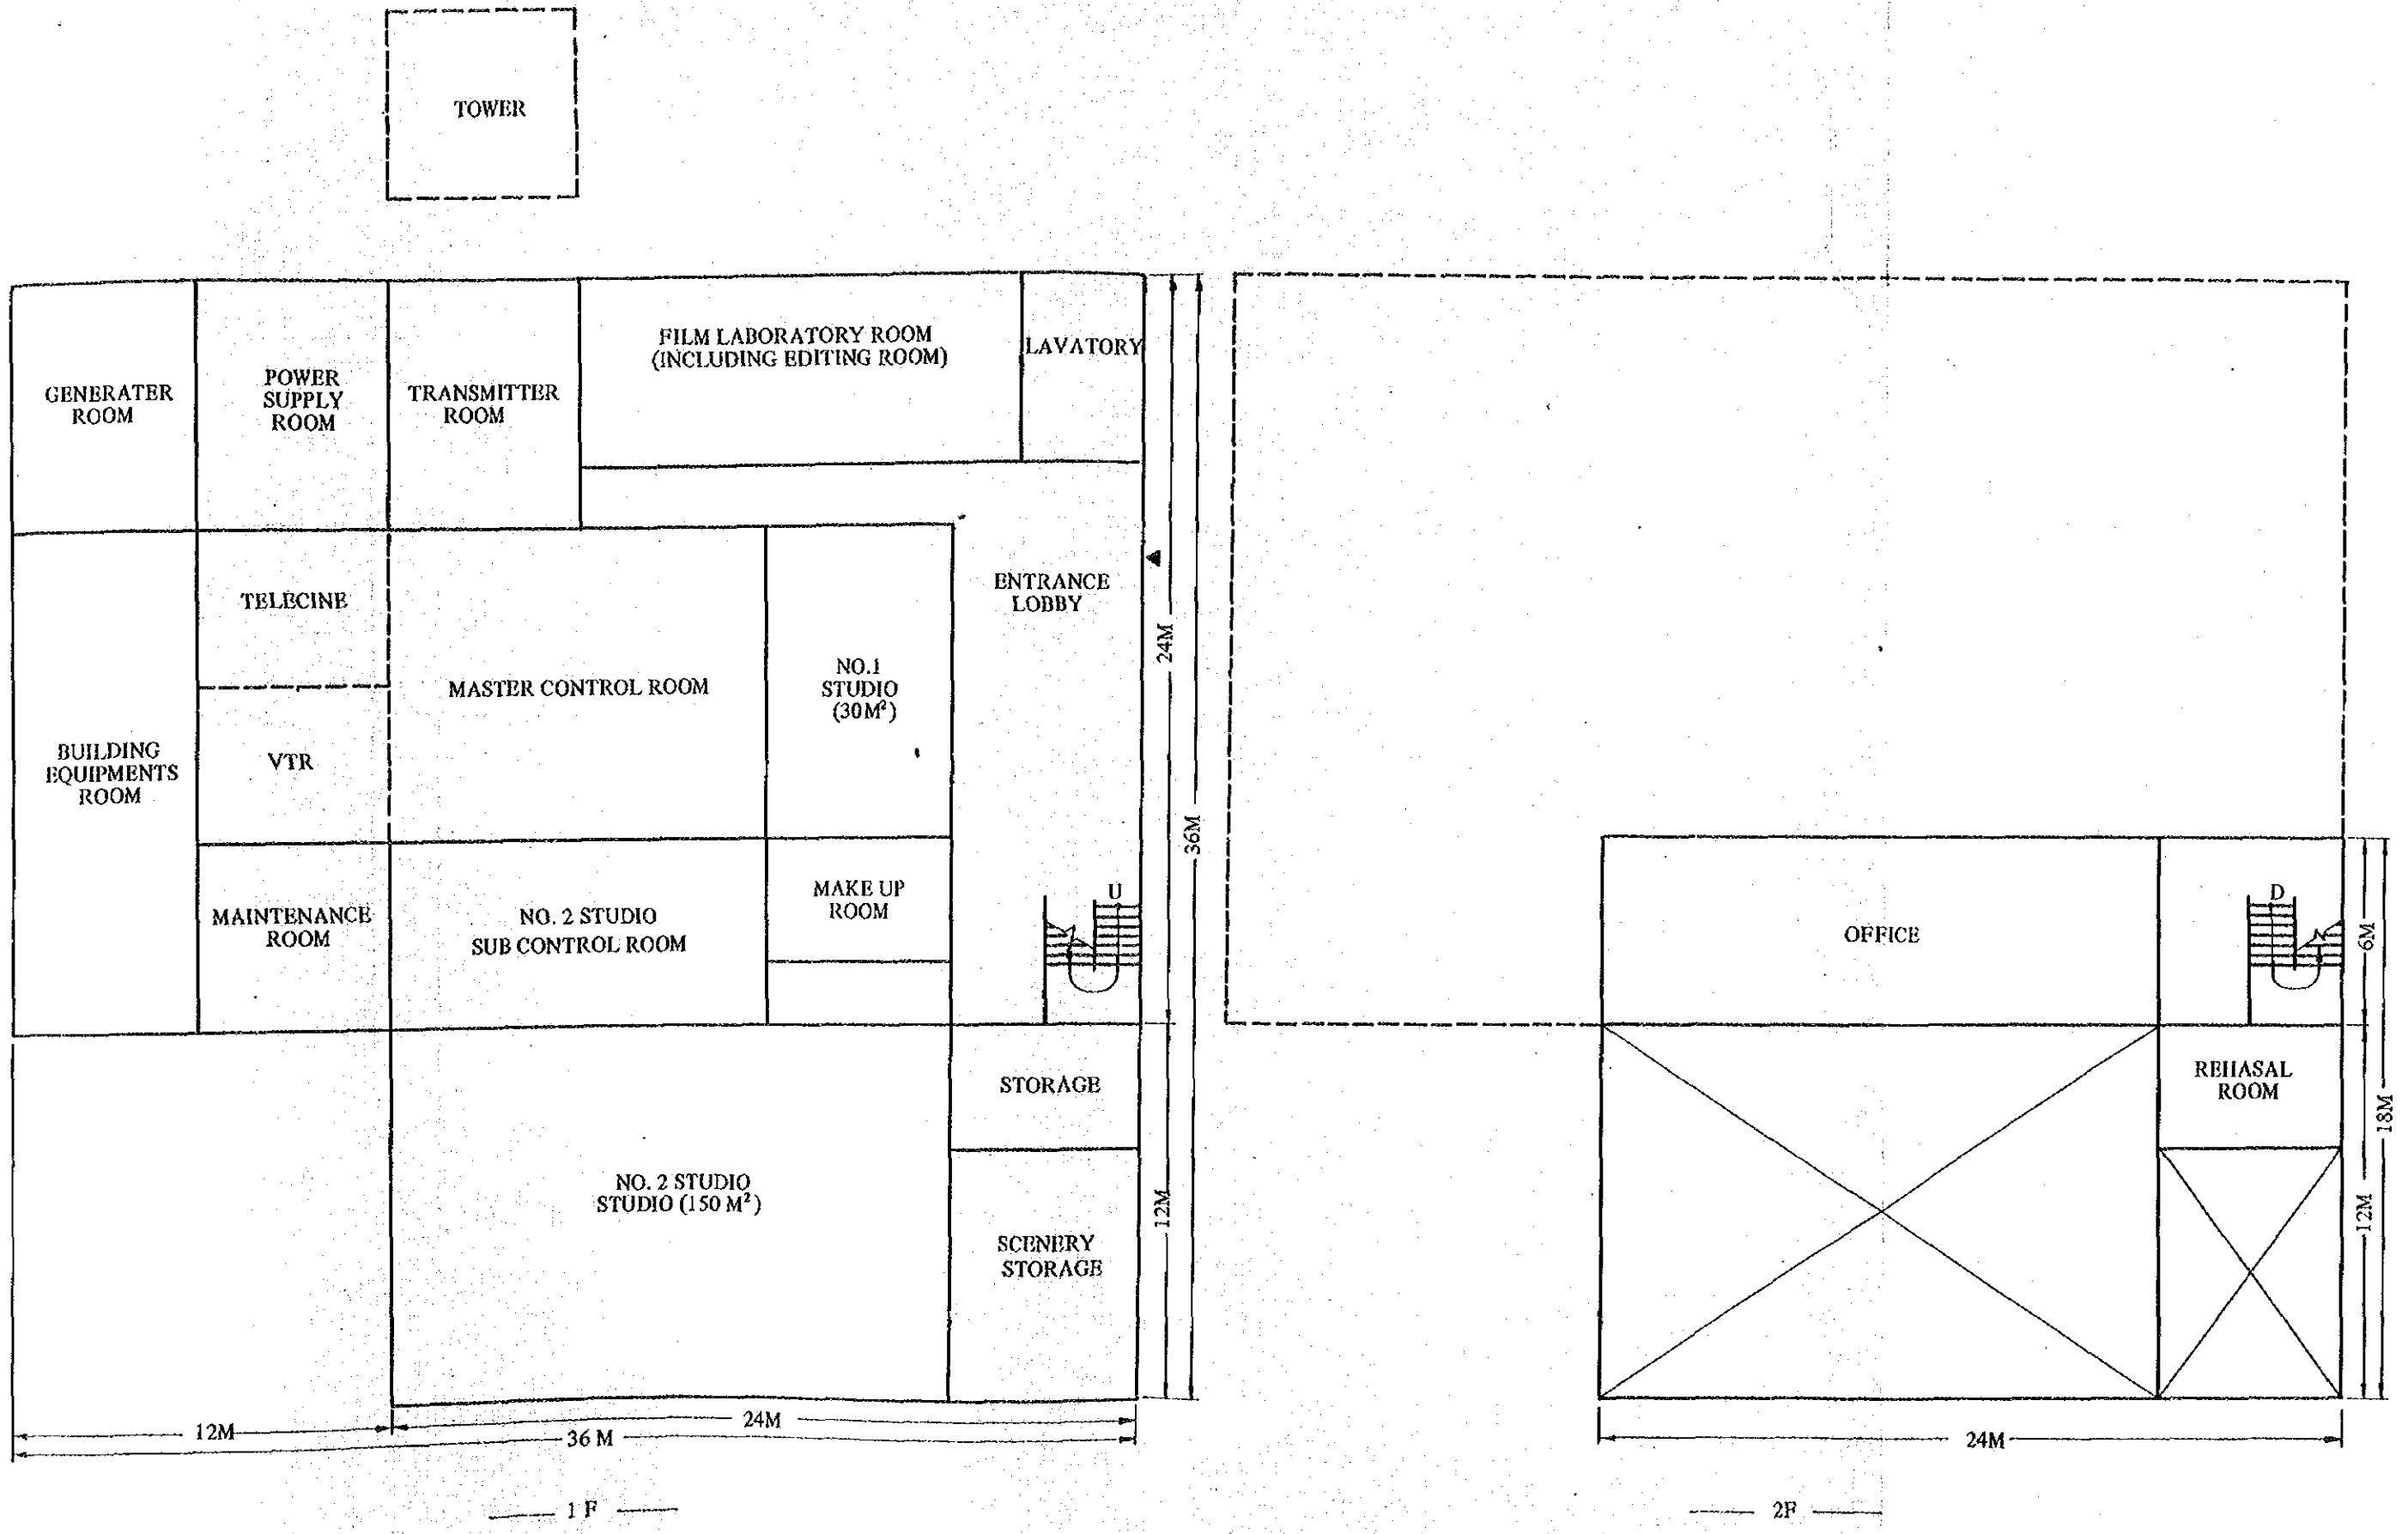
Floor Layout of Main Region Studio Building (An Example)
